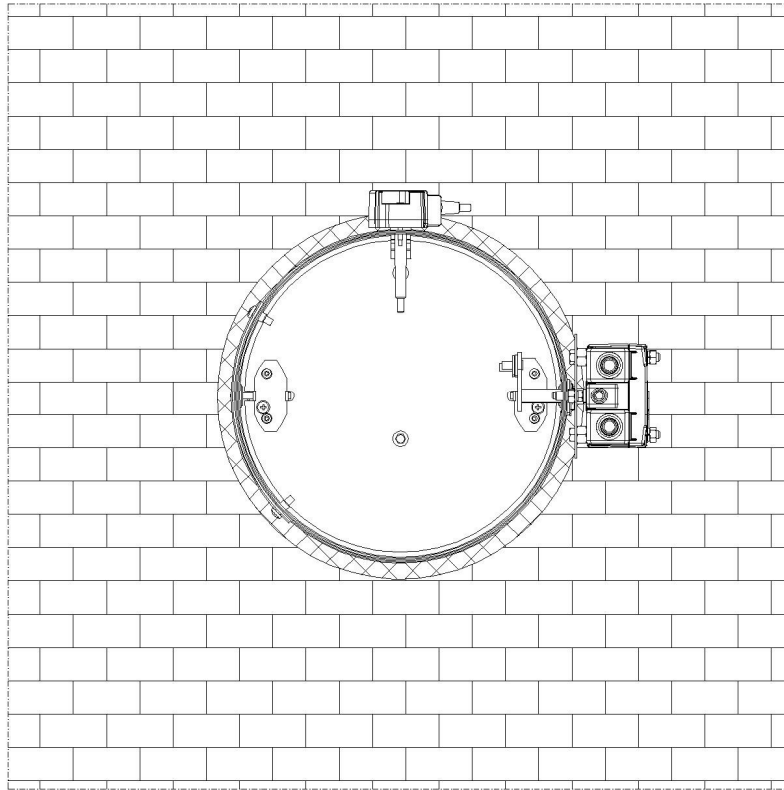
Installation of KTM-O fire dampers in rigid wall with horizontal rotation axis of baffle
